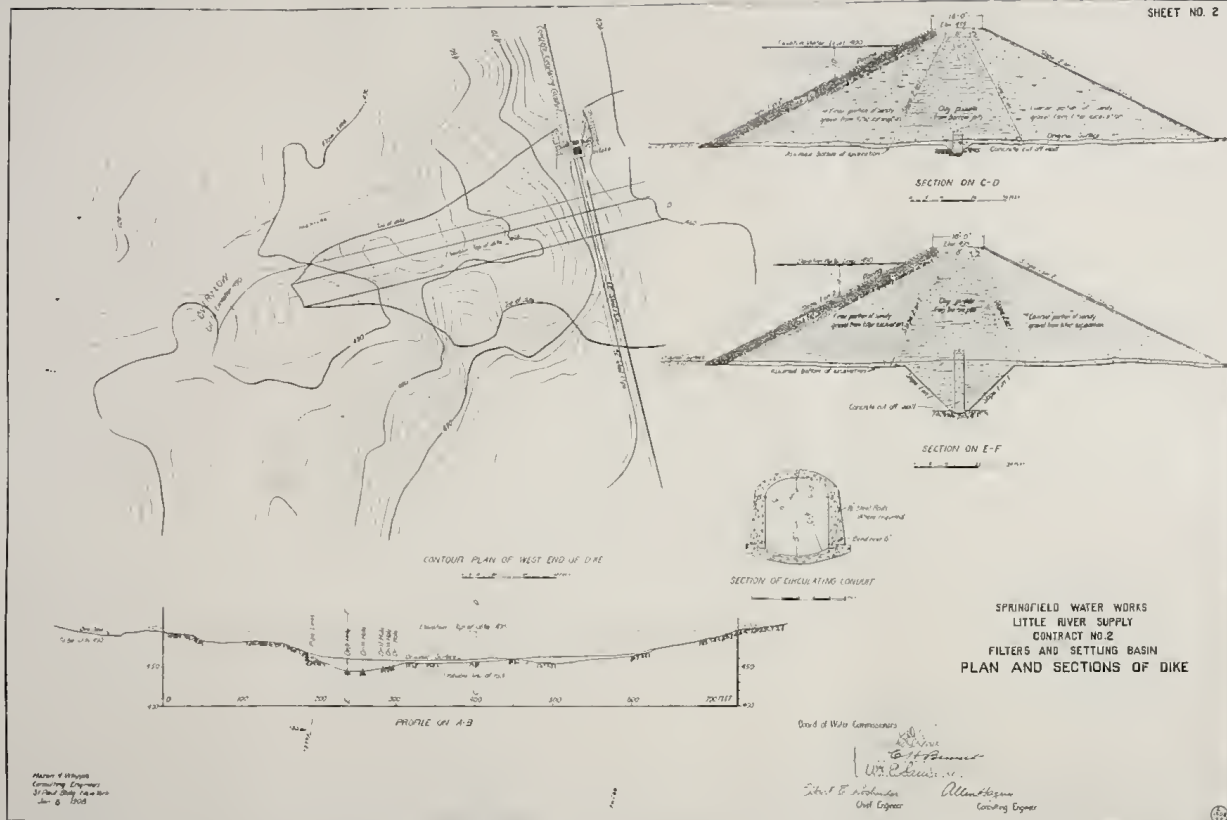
DETAILS OF EARTH DAM CONSTRUCTION.
